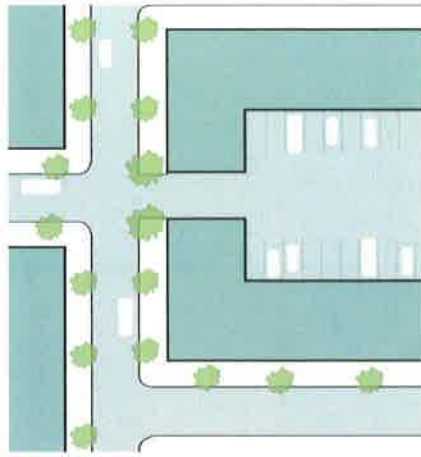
Car park sleeved with liner buildings to screen new or existing car parks
